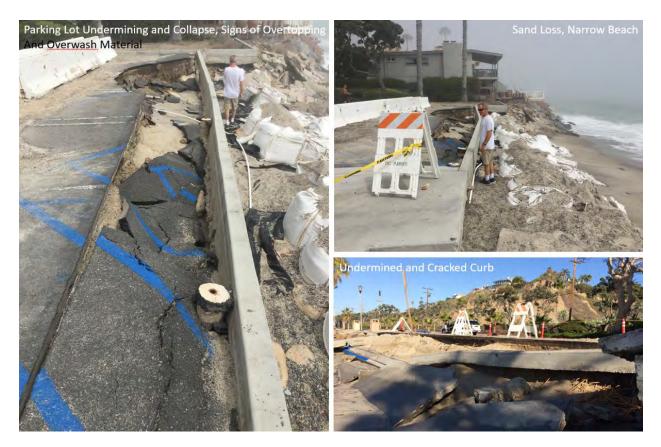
SOUTH REACH – DAMAGED PARKING LOT AND ERODED BEACH CONDITIONS
